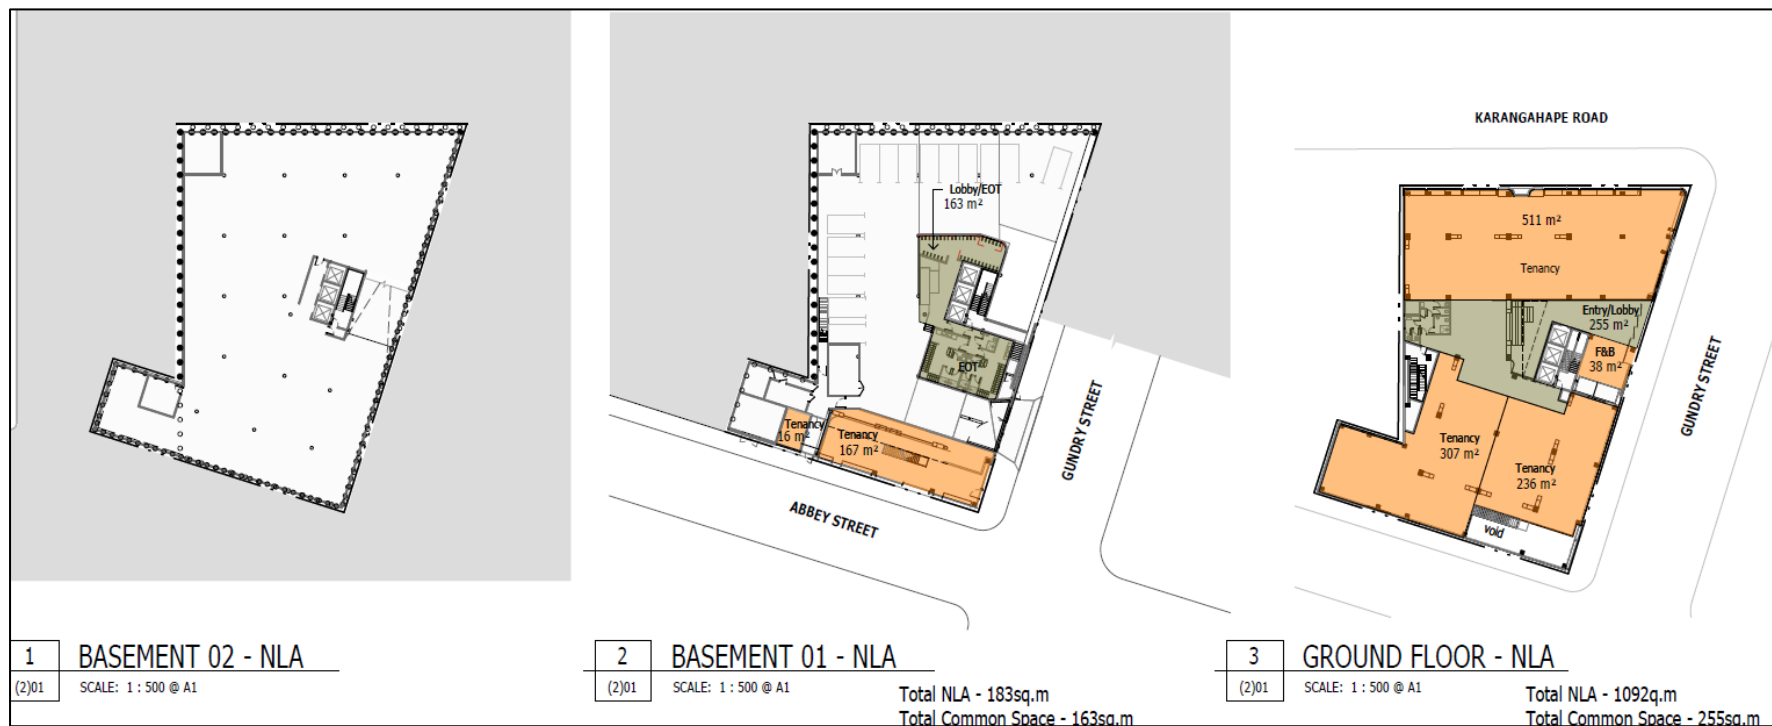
Layout Plans of the two basement levels and ground floor level (source: Fearon Hay)
